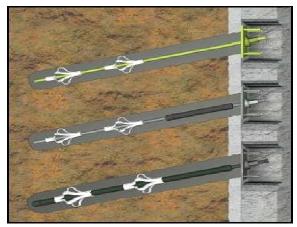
Cross-section of a grouted soil nailed wall (Ref: <u>www.williamsform.com</u>)
